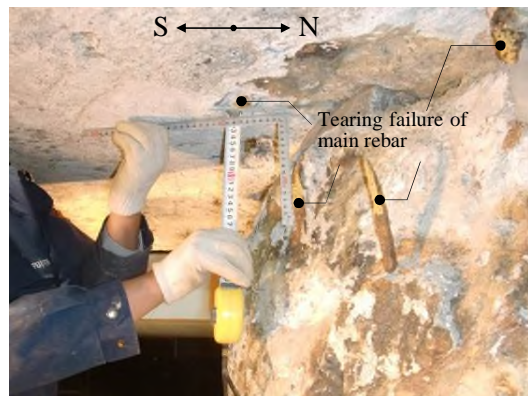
Combined type with Type B) and Type C); Shear failure after bending yield
